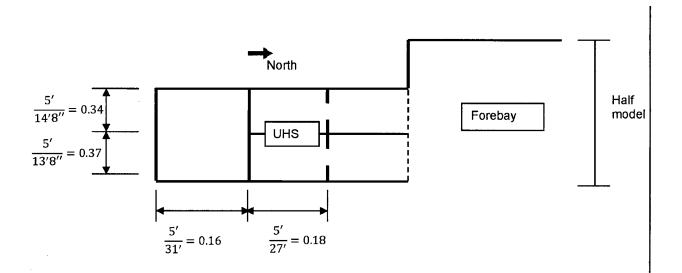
Floor Thickness/Span Length Ratio for Slabs In the UHS MWIS at Elevation 11'-6"
